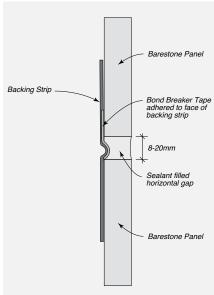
Backing Strip & Bond Breaker Tape
